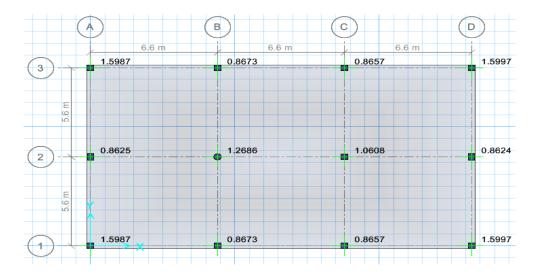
Along shorter side reinforcement(SAFE:ACI, with staggered column)
